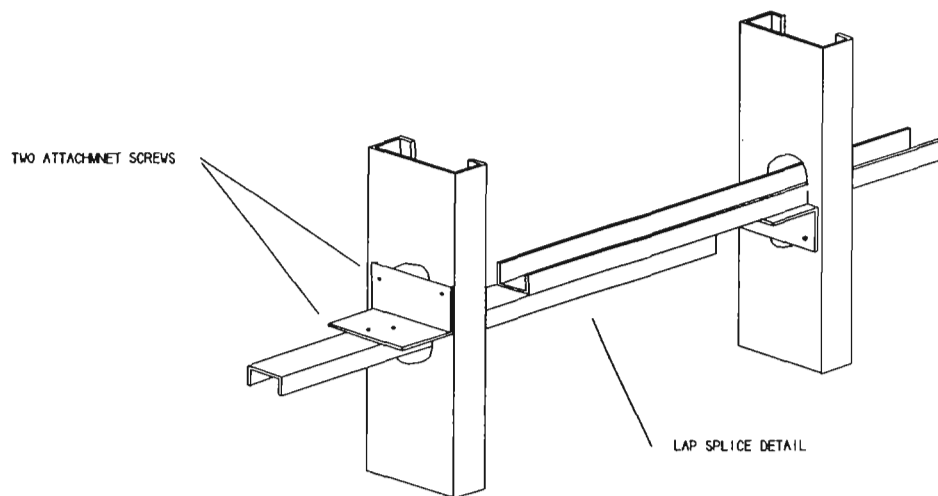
TYPICAL BRIDGING DETAILS
